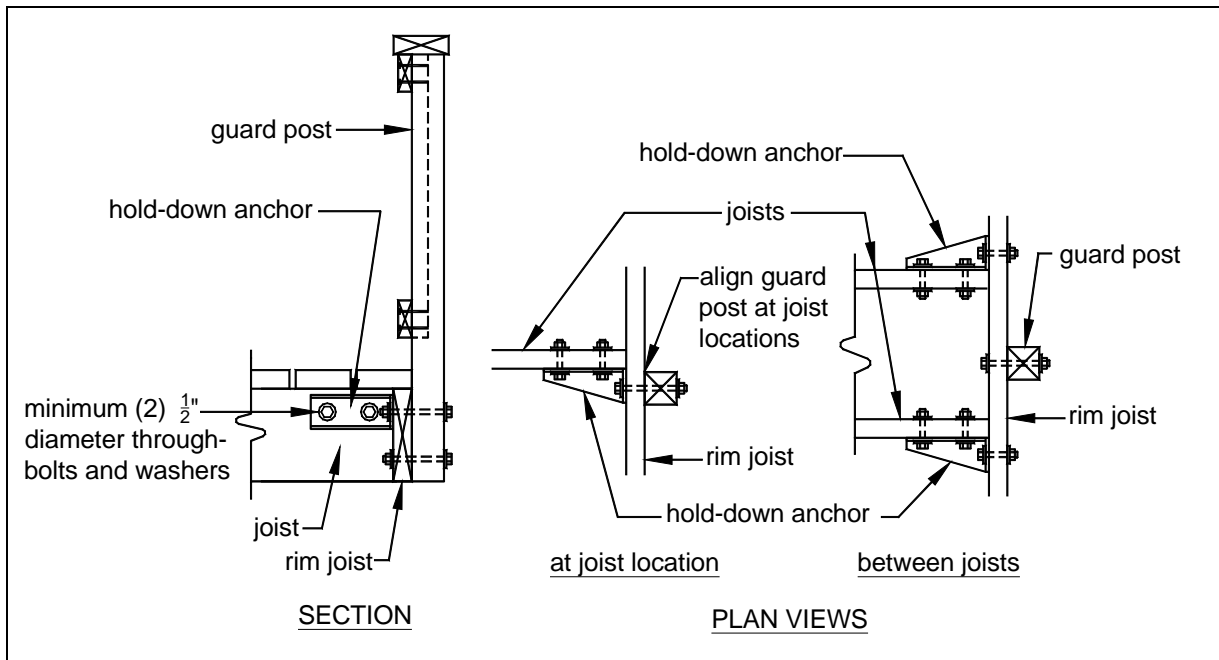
GUARD POST TO RIM JOIST DETAIL
